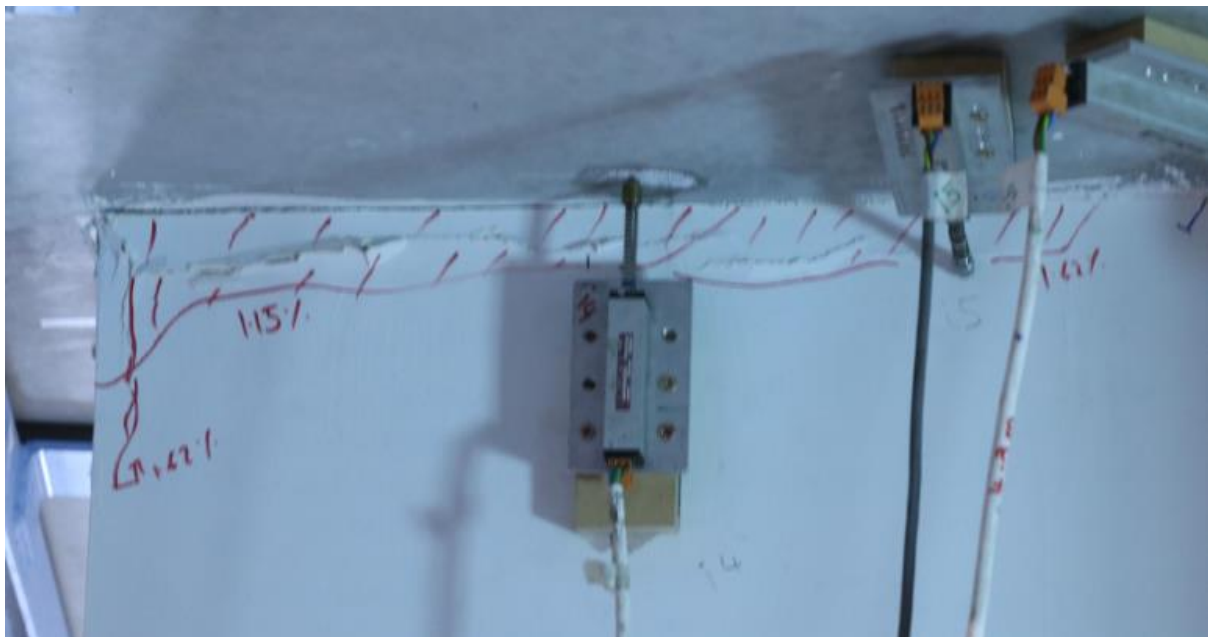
Specimen B1 – Step 12 – DS1b: Plaster cracking along L-Trim – location 20
